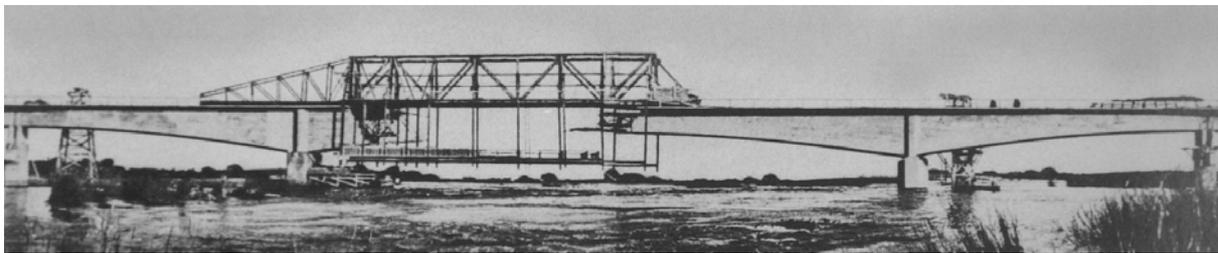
Railroad bridge across the Lualaba River at Kongola in the former Belgian Congo, first reinforced concrete bridge built using a launching gantry, 1938. (Wittfoht)
